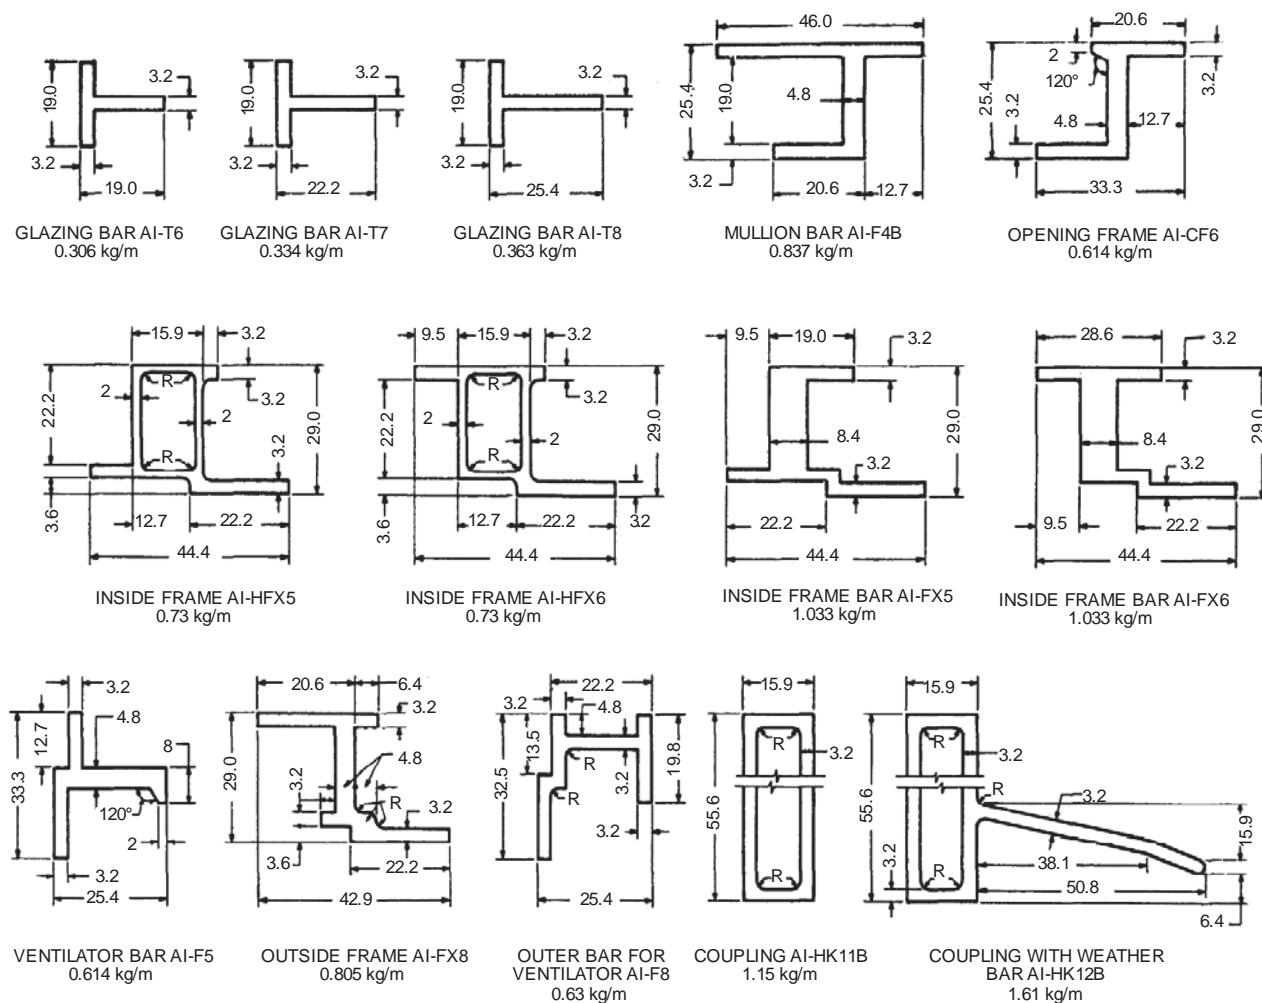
Types and Size of Aluminium Doors, Windows and Ventilators
